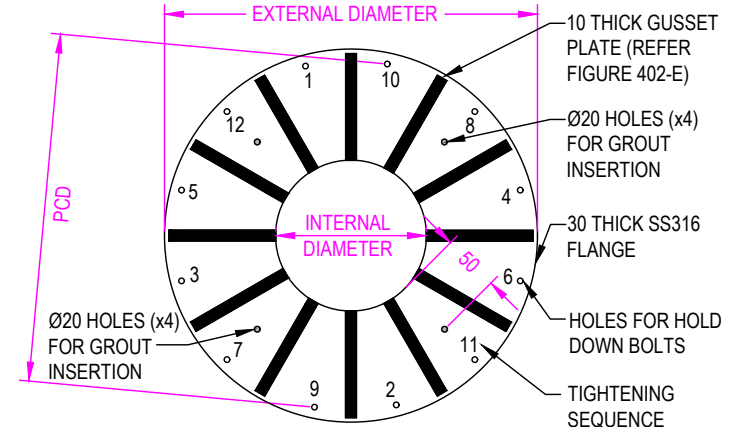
H: VENT SHAFT BASE FLANGED SUPPORT (12 HOLD DOWN BOLTS SHOWN)
